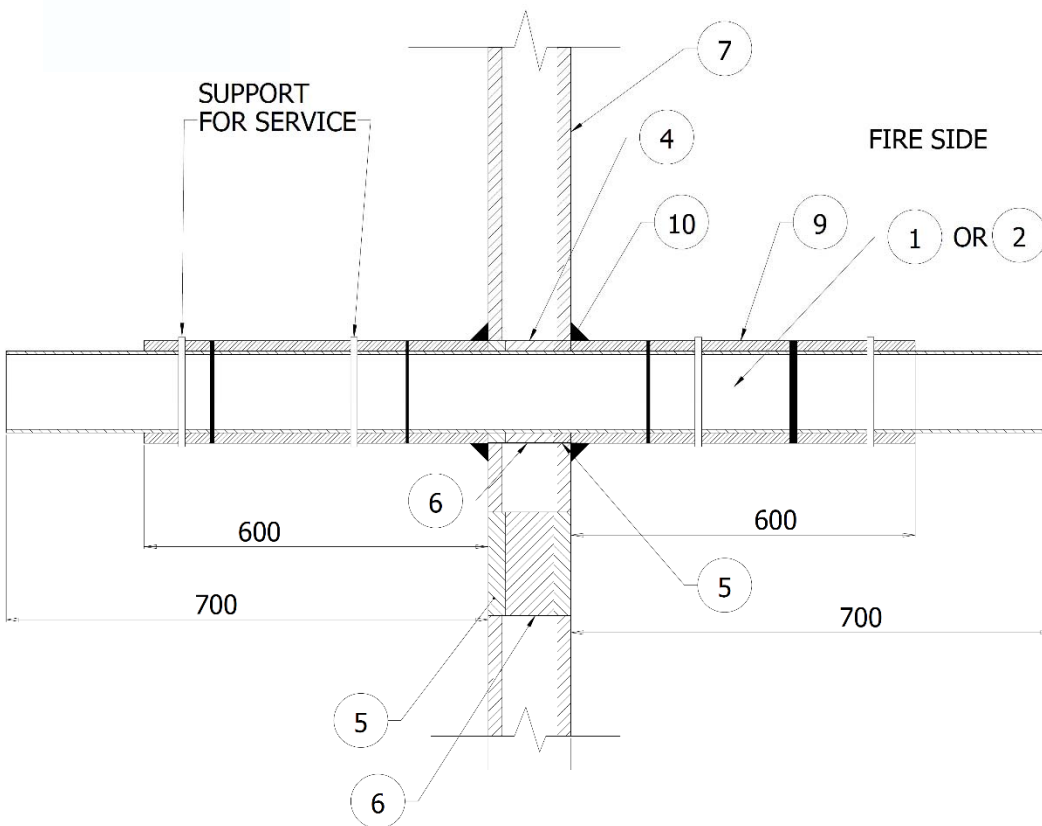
Typical detail for wrapped pipes for plasterboard lined walls
